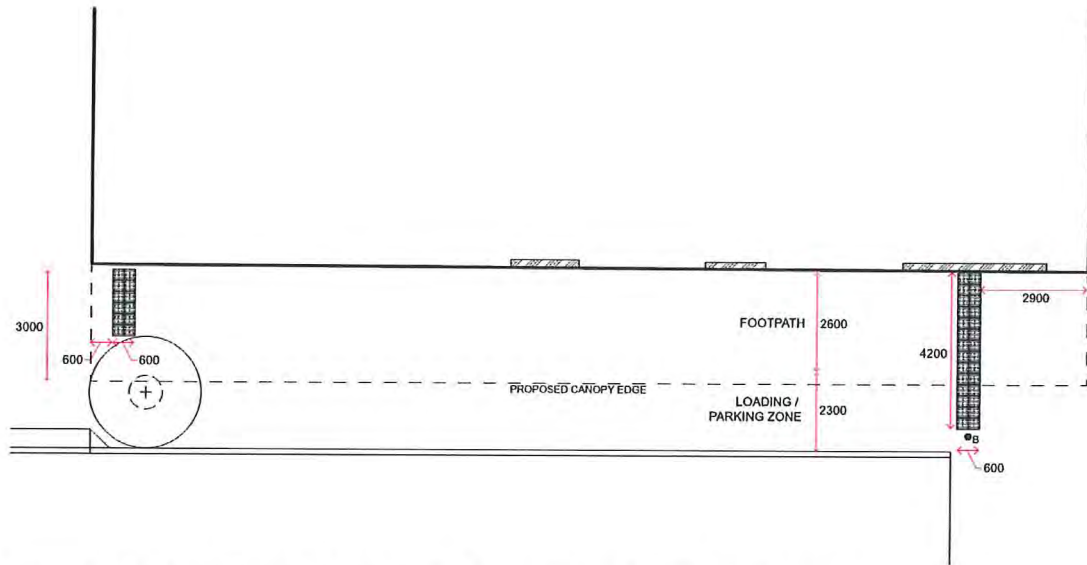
Plan Showing Subject Site and Gawler Place Upgrade
